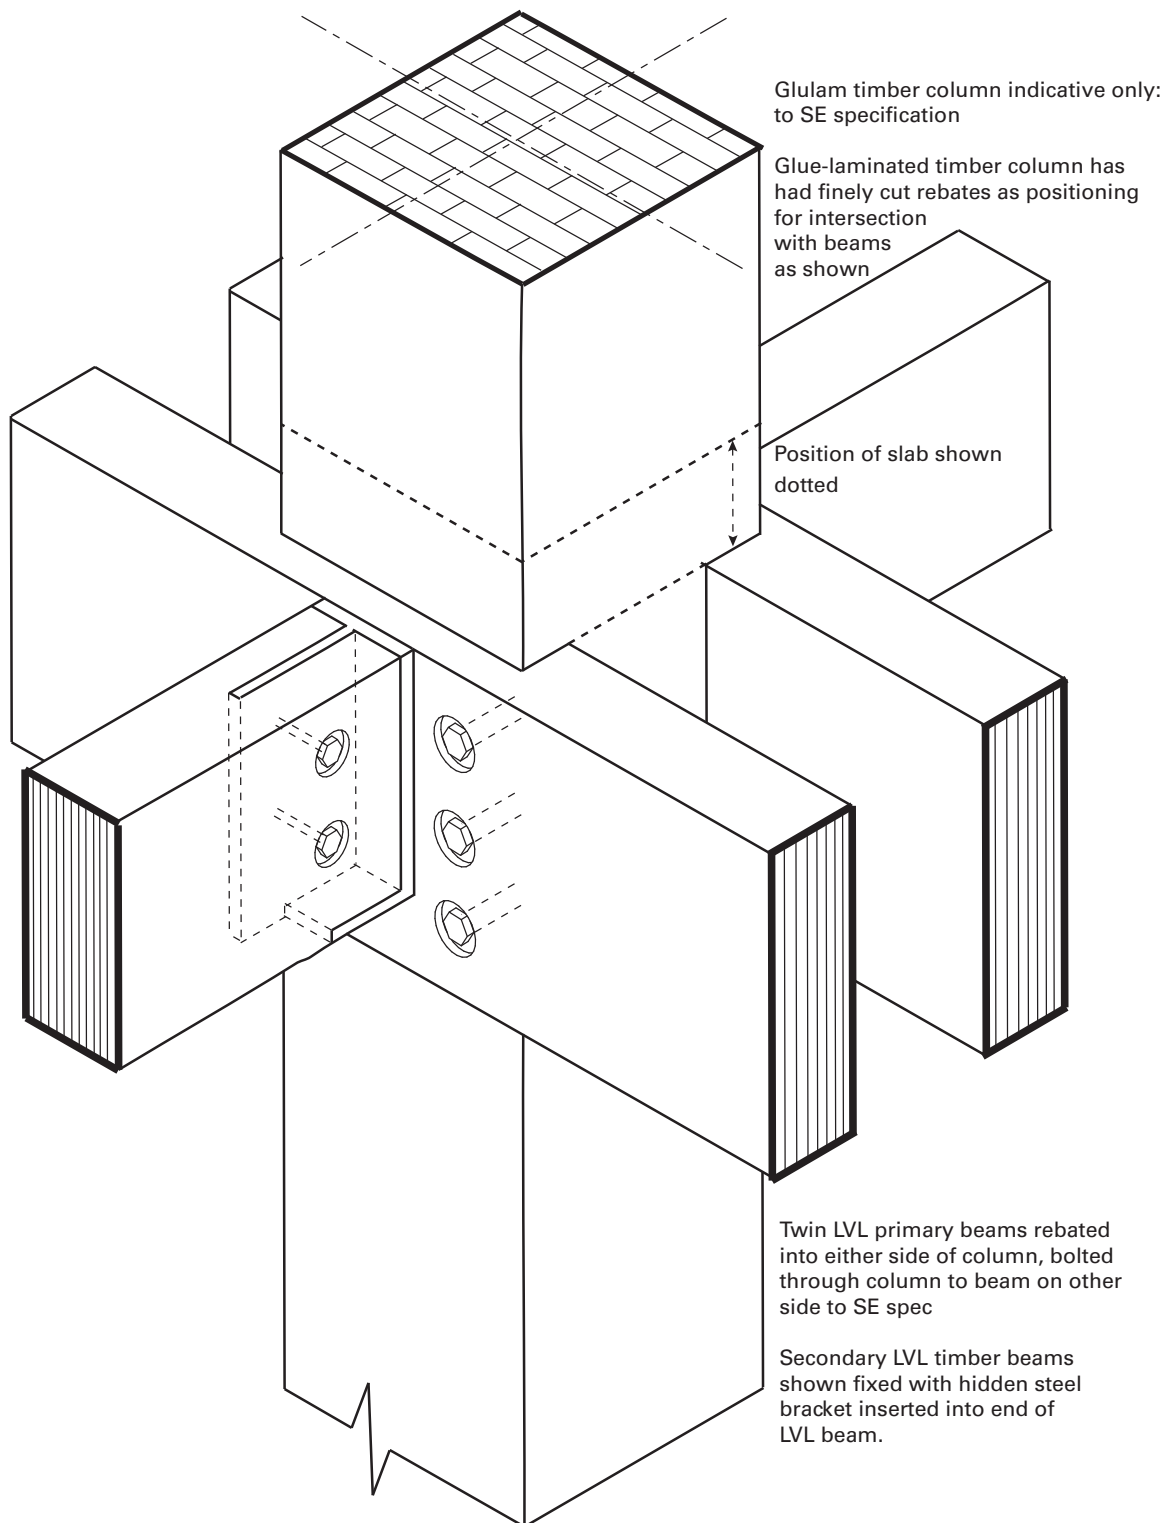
Typical engineered timber column/beam junction (slab not shown)
